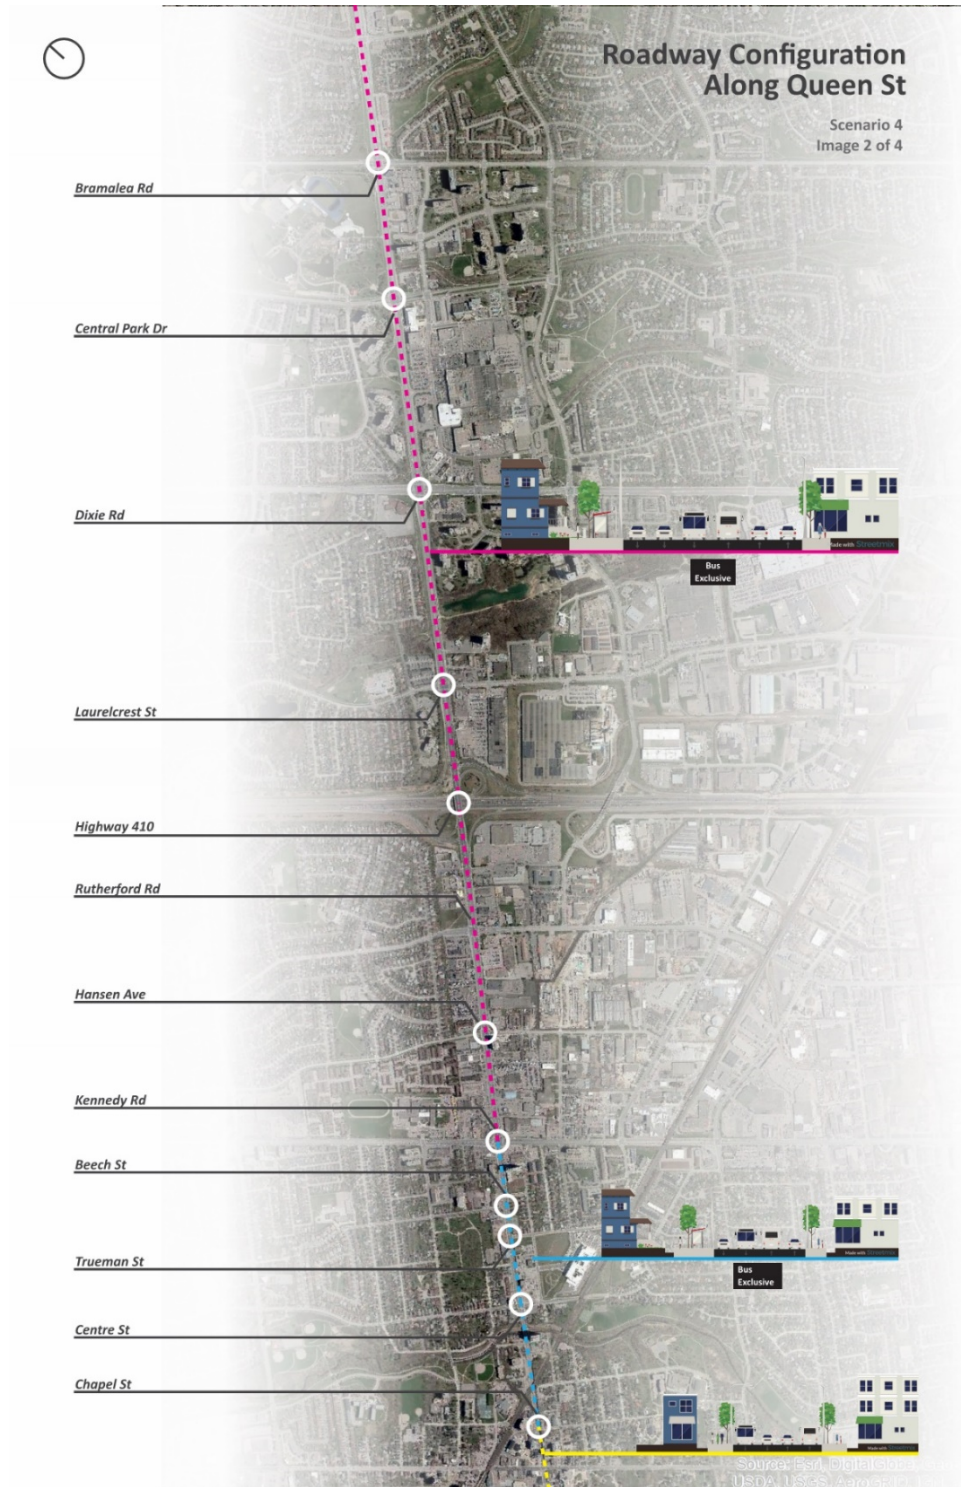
Scenario 4 road configuration, Chapel Street to Bramalea Road
